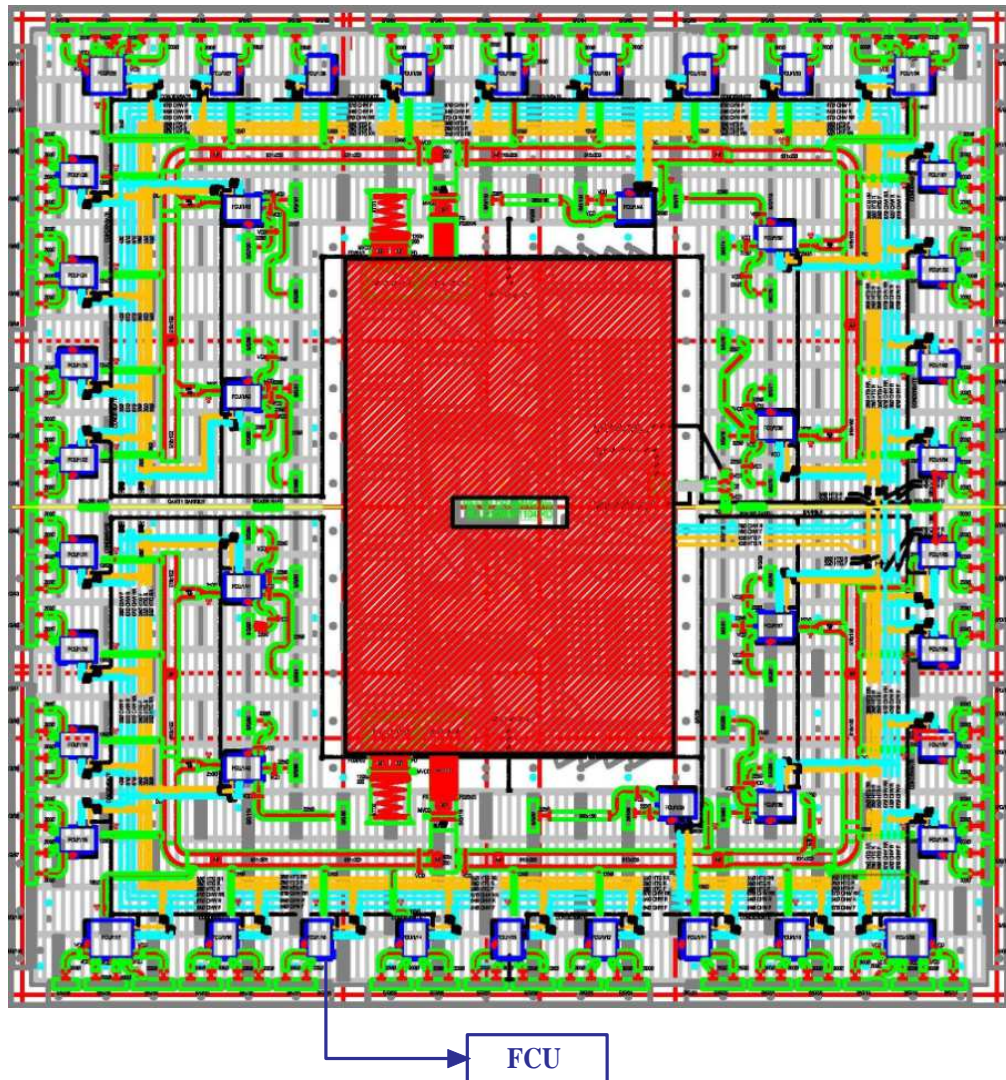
Floor plan for all FCU's distribution across first floor- for case study-1.
